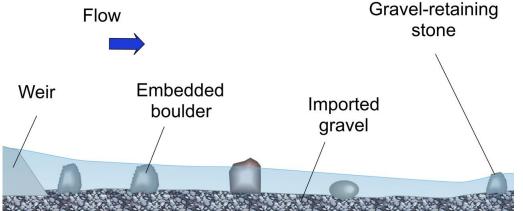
Elevation view showing concept of rubble mat (imported gravel and embedded boulders to stabilise and provide structure). Expert calculations are required to ascertain the required flow conveyance to sufficiently raise the downstream water level.
